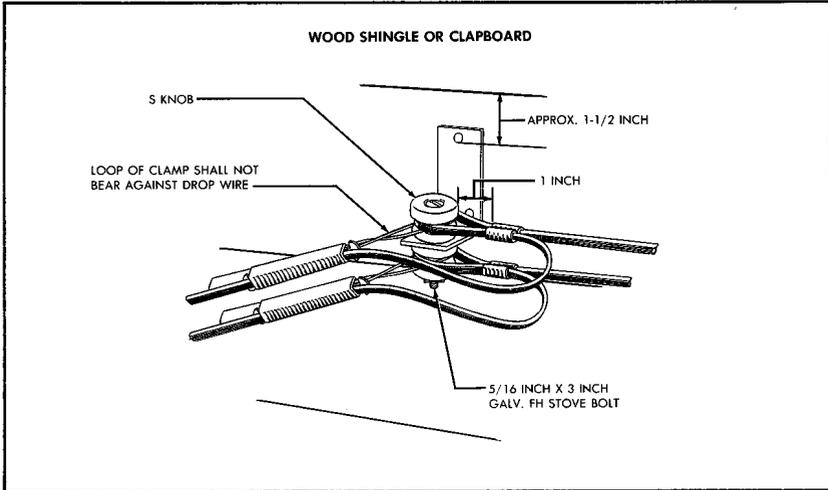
First Attachment, House Bracket (Drop Wire Run in Horizontal Direction On Building)
